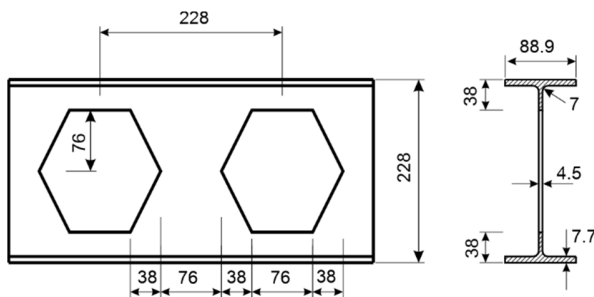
Opening distribution and section details of an FE analyzed castellated beam.
